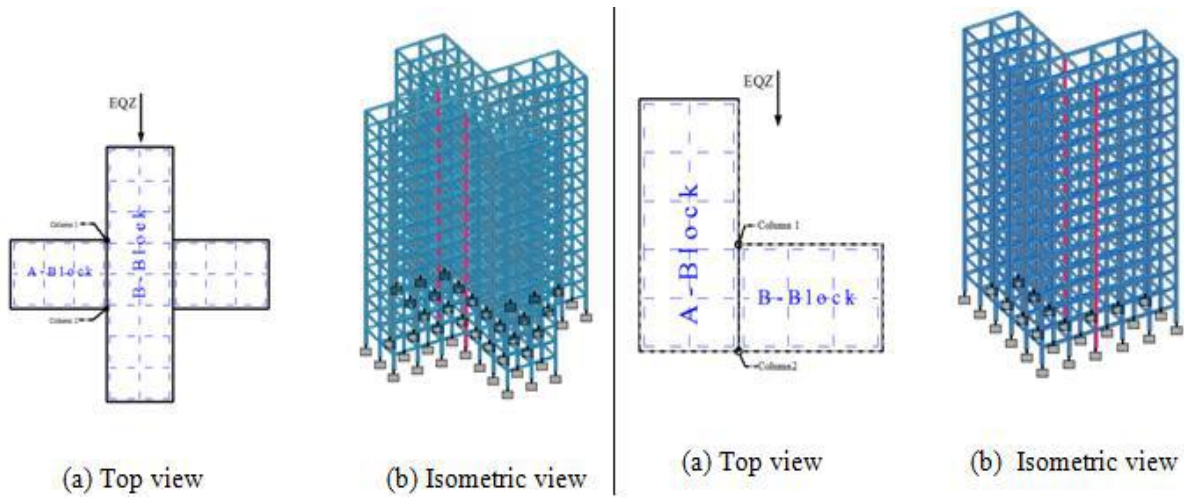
Model Of Cross Shape and L Shape Building [11]
